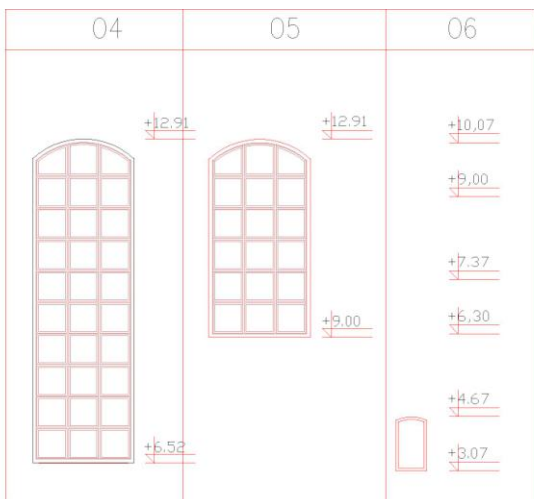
Windows type 04 for apse, 05 for main nave and 06 for towers
